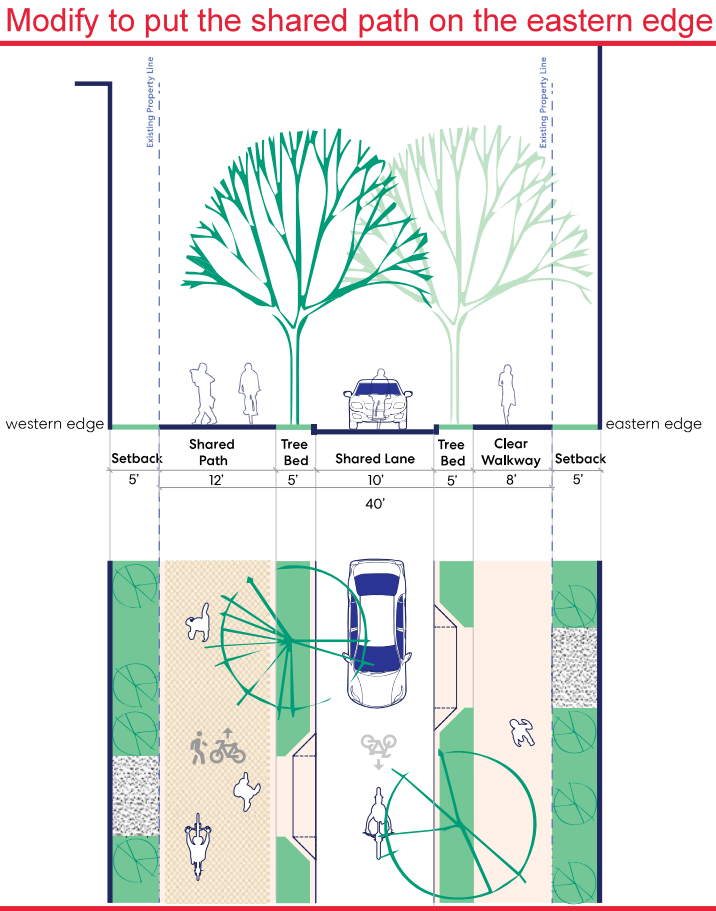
Typical Ash Street section between Page Mill Road and Olive Avenue
